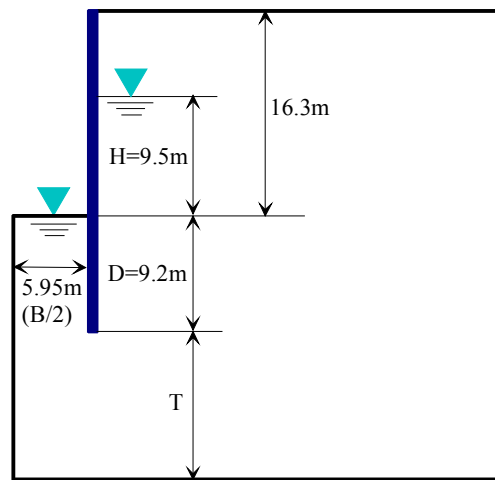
Schematic geometry of case one (Length of excavation=21.2m)
